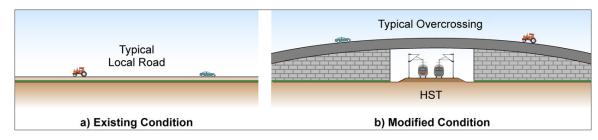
Adding Local Roadway Overcrossings above HSR Guideway
